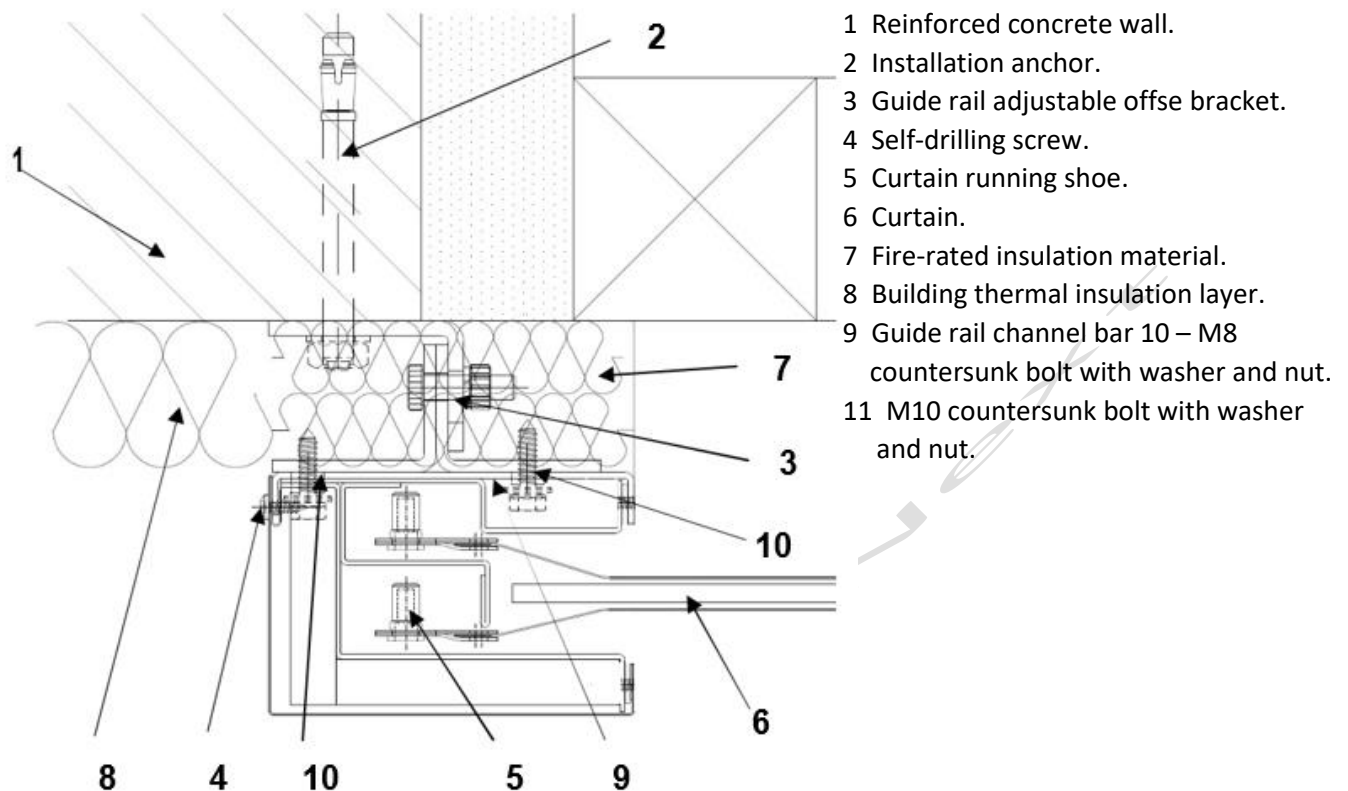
Wall-mounted installation of the guide rail with fire-proof insulation
